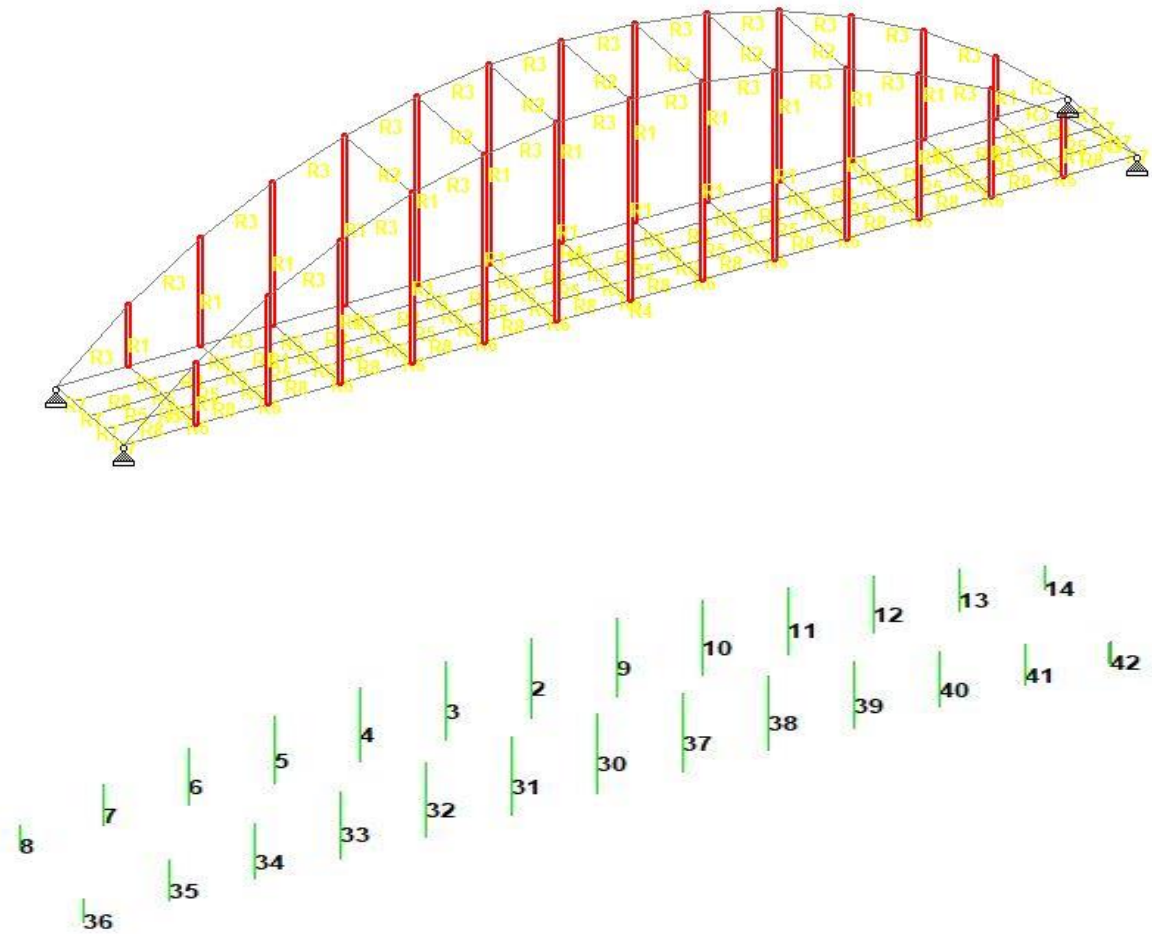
BOW STRING ARCH BRIDGE WITH NETWORK CONFIGURATION OF HANGERS
